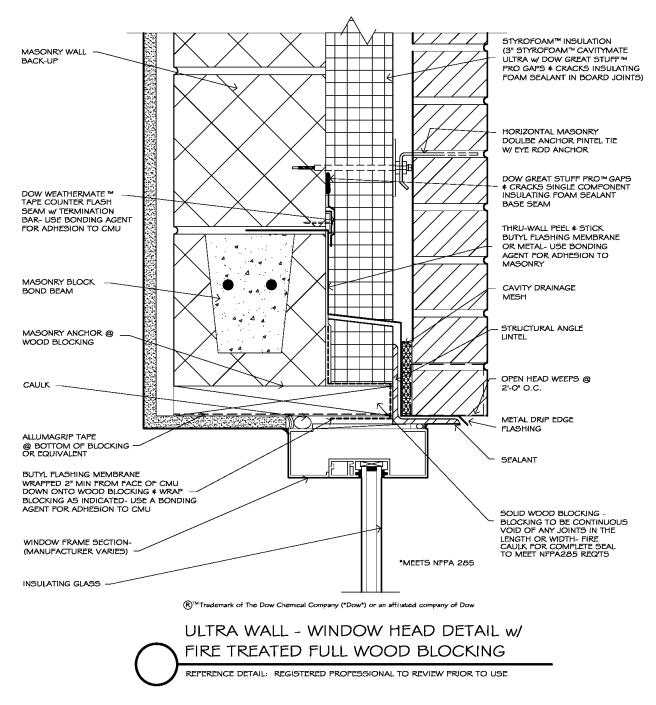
Window / Door Header Detail with FR Wood Blocking
